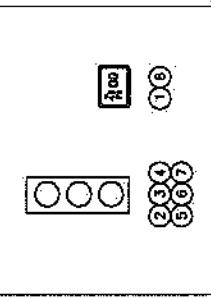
CORTEN TORRES STREET SIGNAL MODIFICATION PLAN
